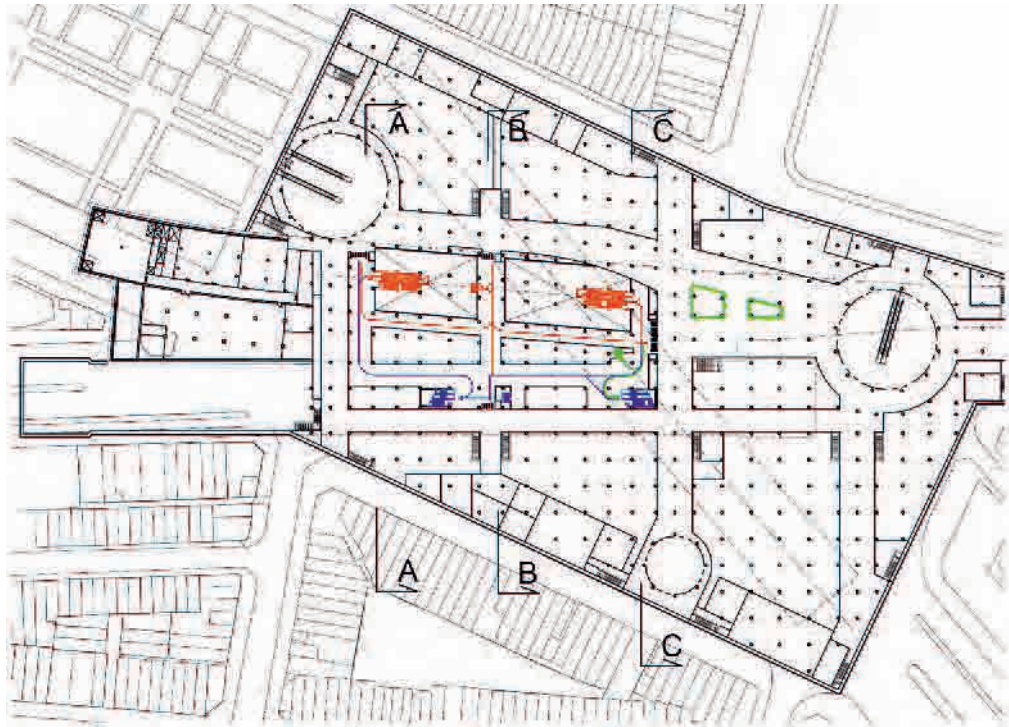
The general plan of B1 floor, Ben Thanh Central Station
